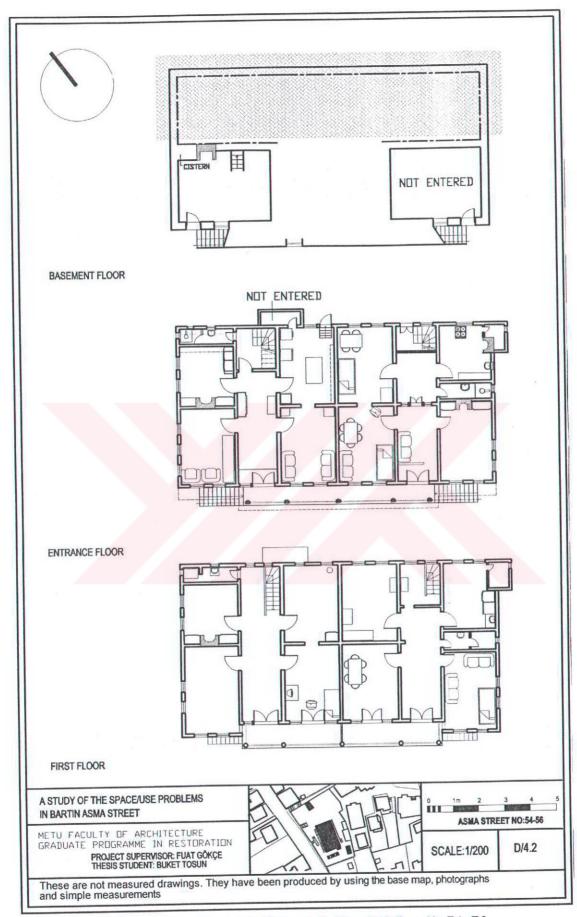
Sketch Drawings of Plans of The Building No:54-56
